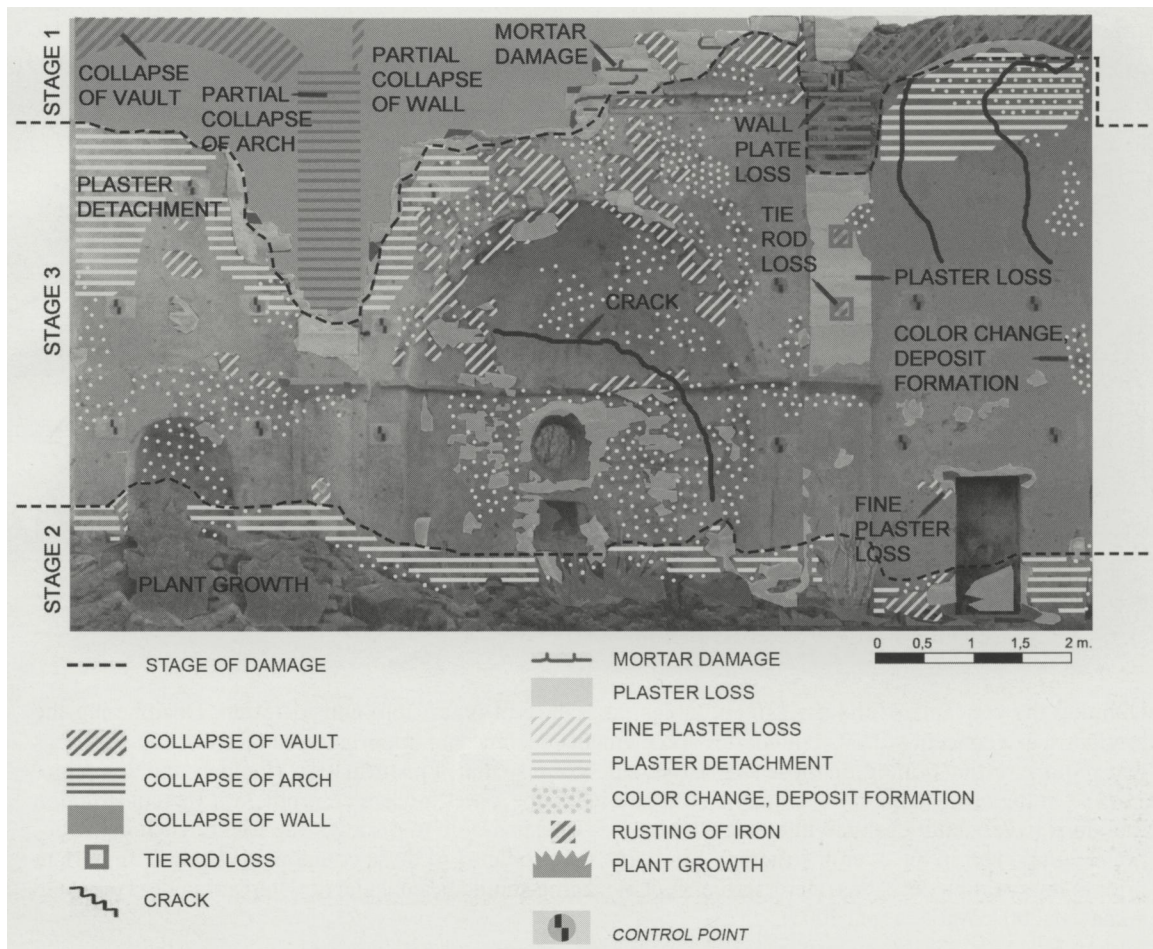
Map illustrating the structural failures, material deterioration, and damage stages on the interior facade of the eastern wall.
